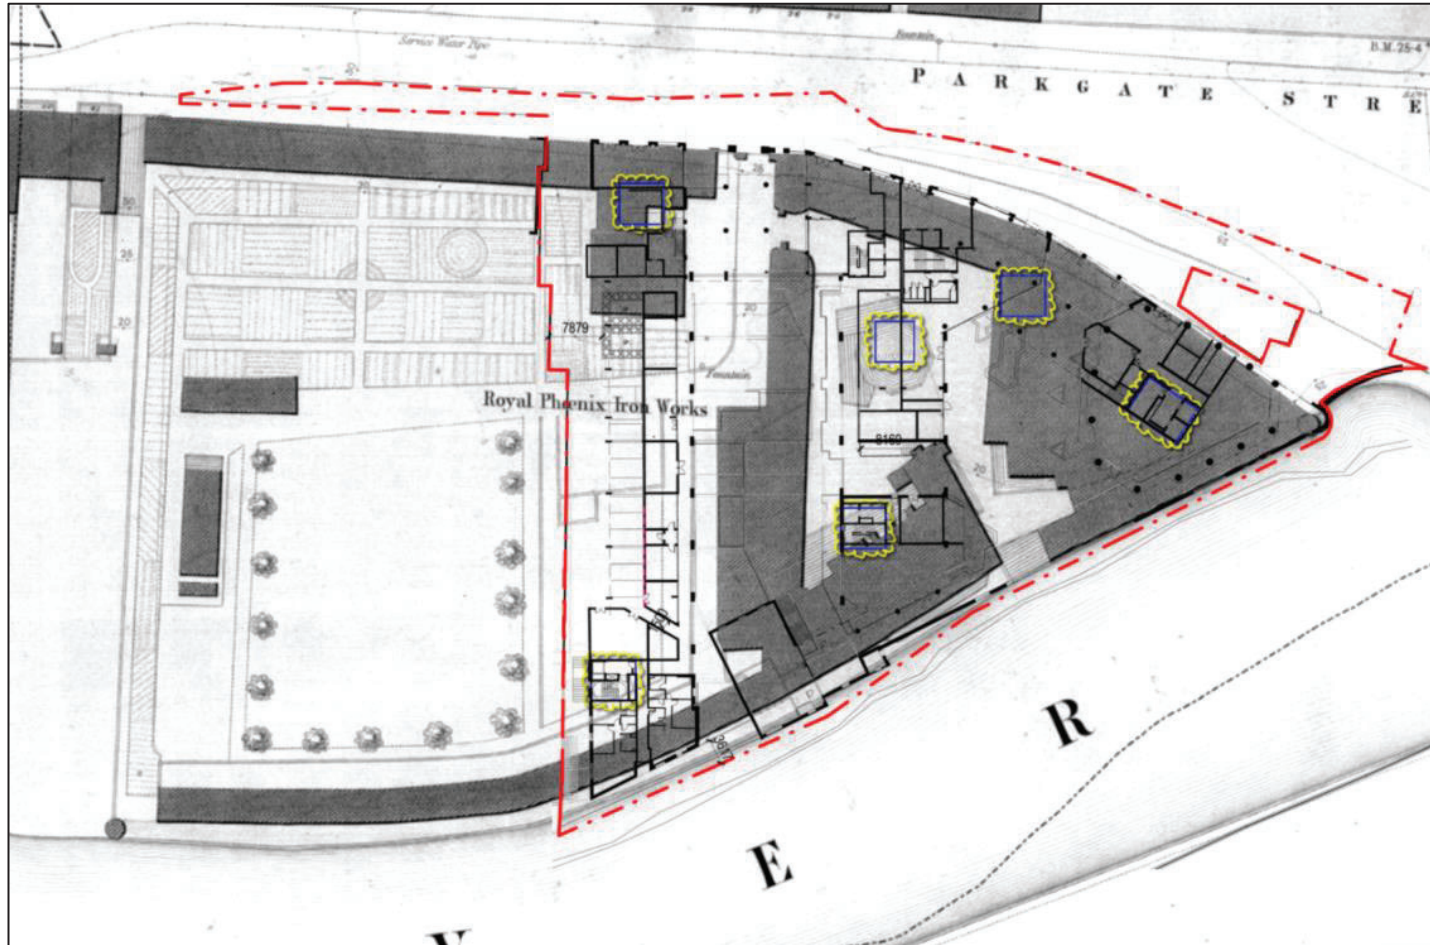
Indicative locations of archaeological test trenches within the proposed development layout, overlaid on to OS 1847 5-foot plan showing Royal Phoenix Iron Works
